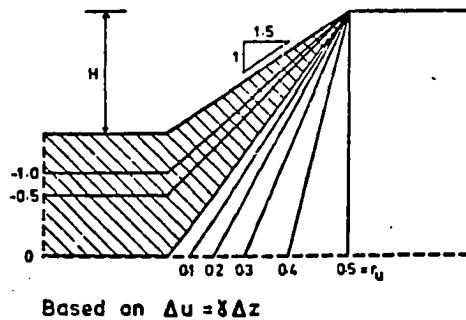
End of construction pore pressure in a 1 on 1.5 cutting slope (after Vaughan and Walbancke, 1973)
